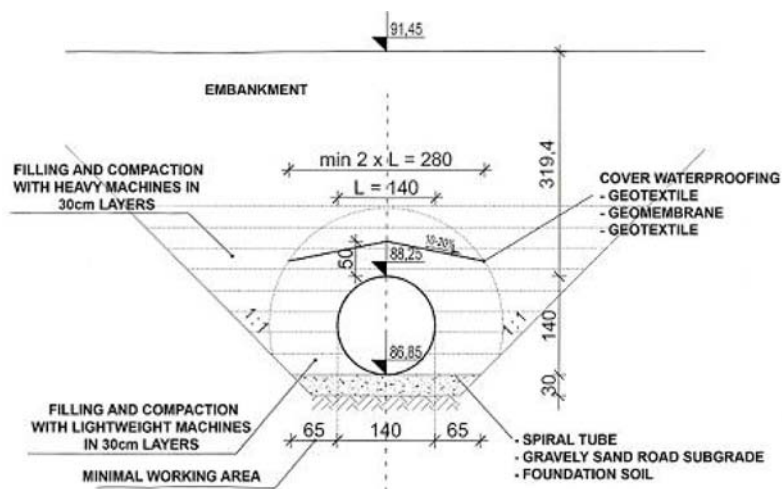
Cover Waterproofing of Steel Pipe Culverts
